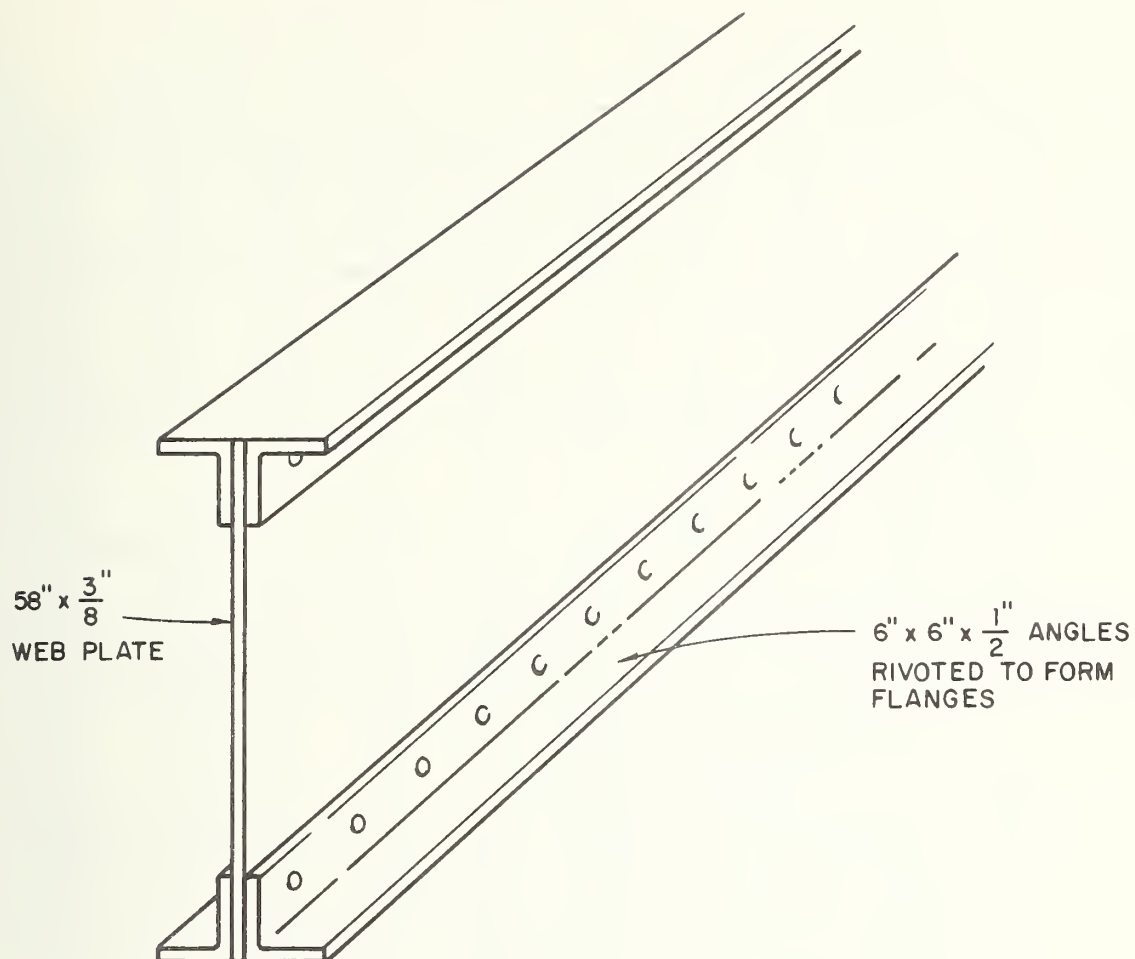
TYPICAL STEEL PLATE GIRDER
